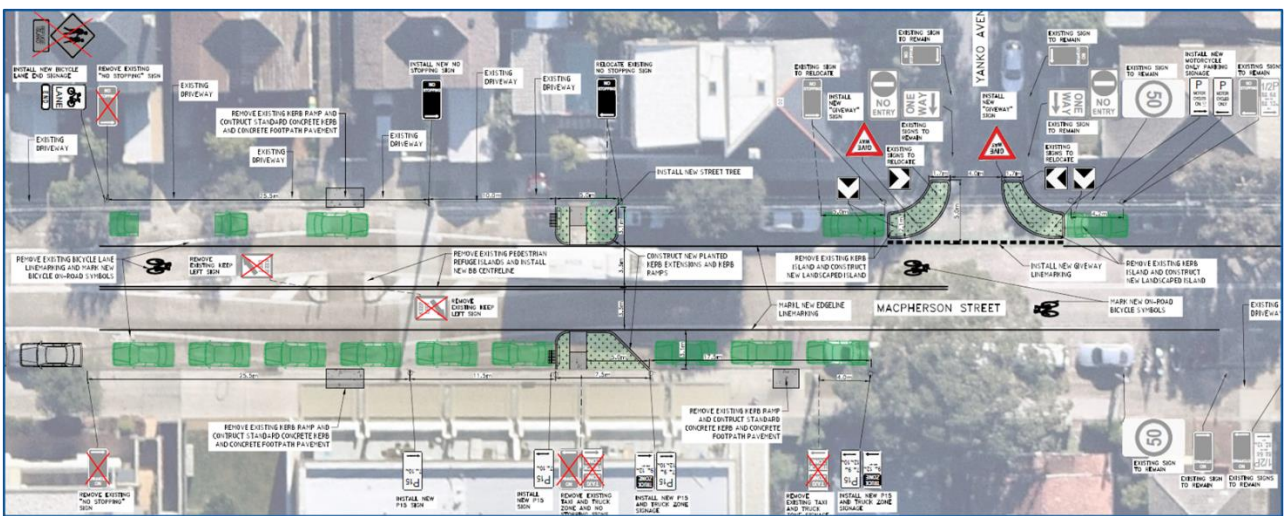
Proposed Kerb-buildout and changes to parking restrictions.
